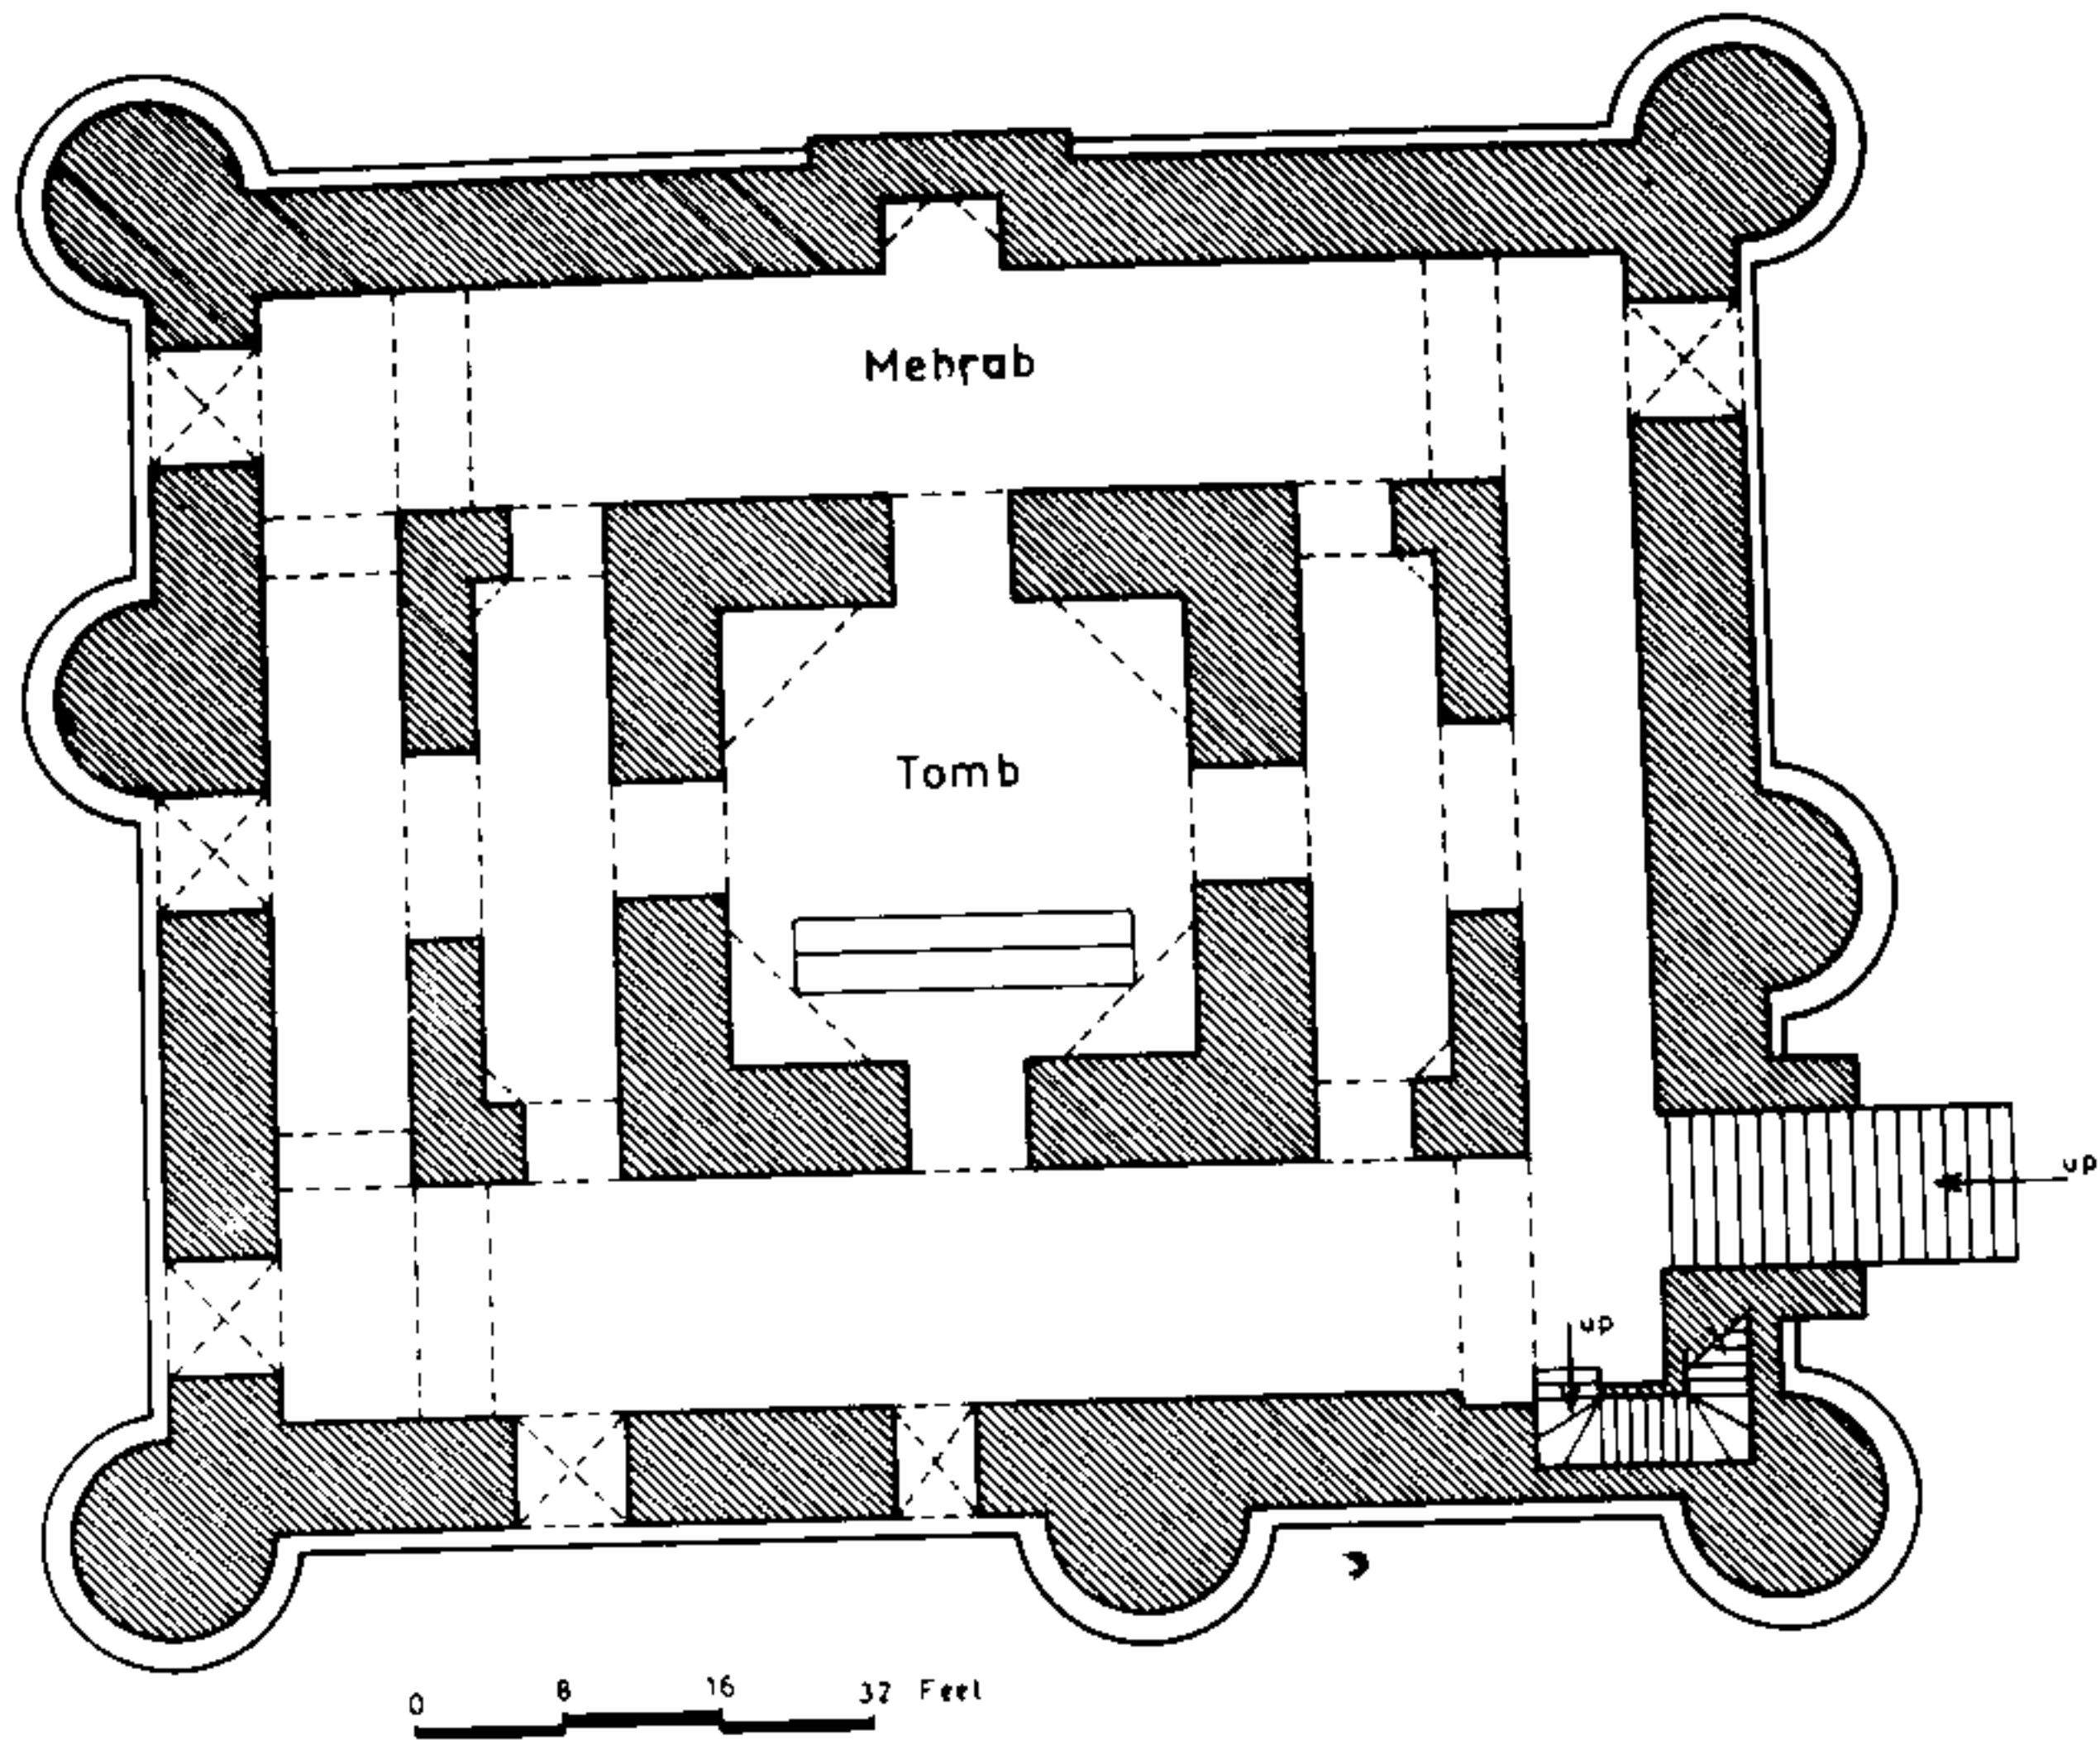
Fig. VII : Kabirwala : Mausoleum of Khalid Walid - The plan.
